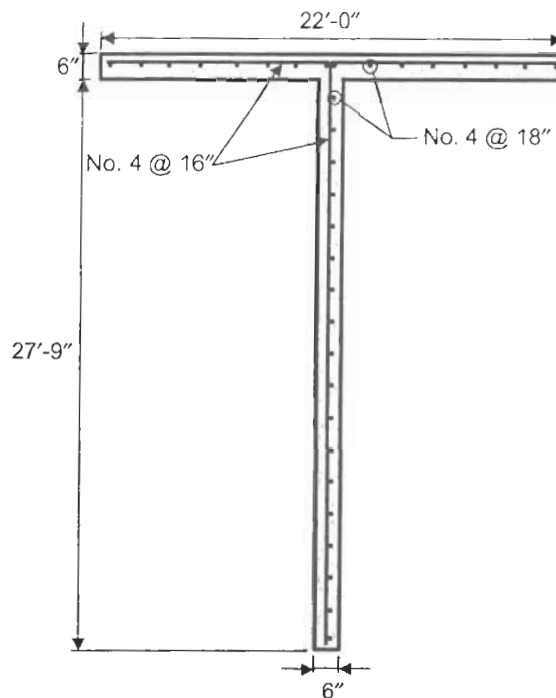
Reinforcement Details for Shear Wall Along Line 5 (SDC A)
